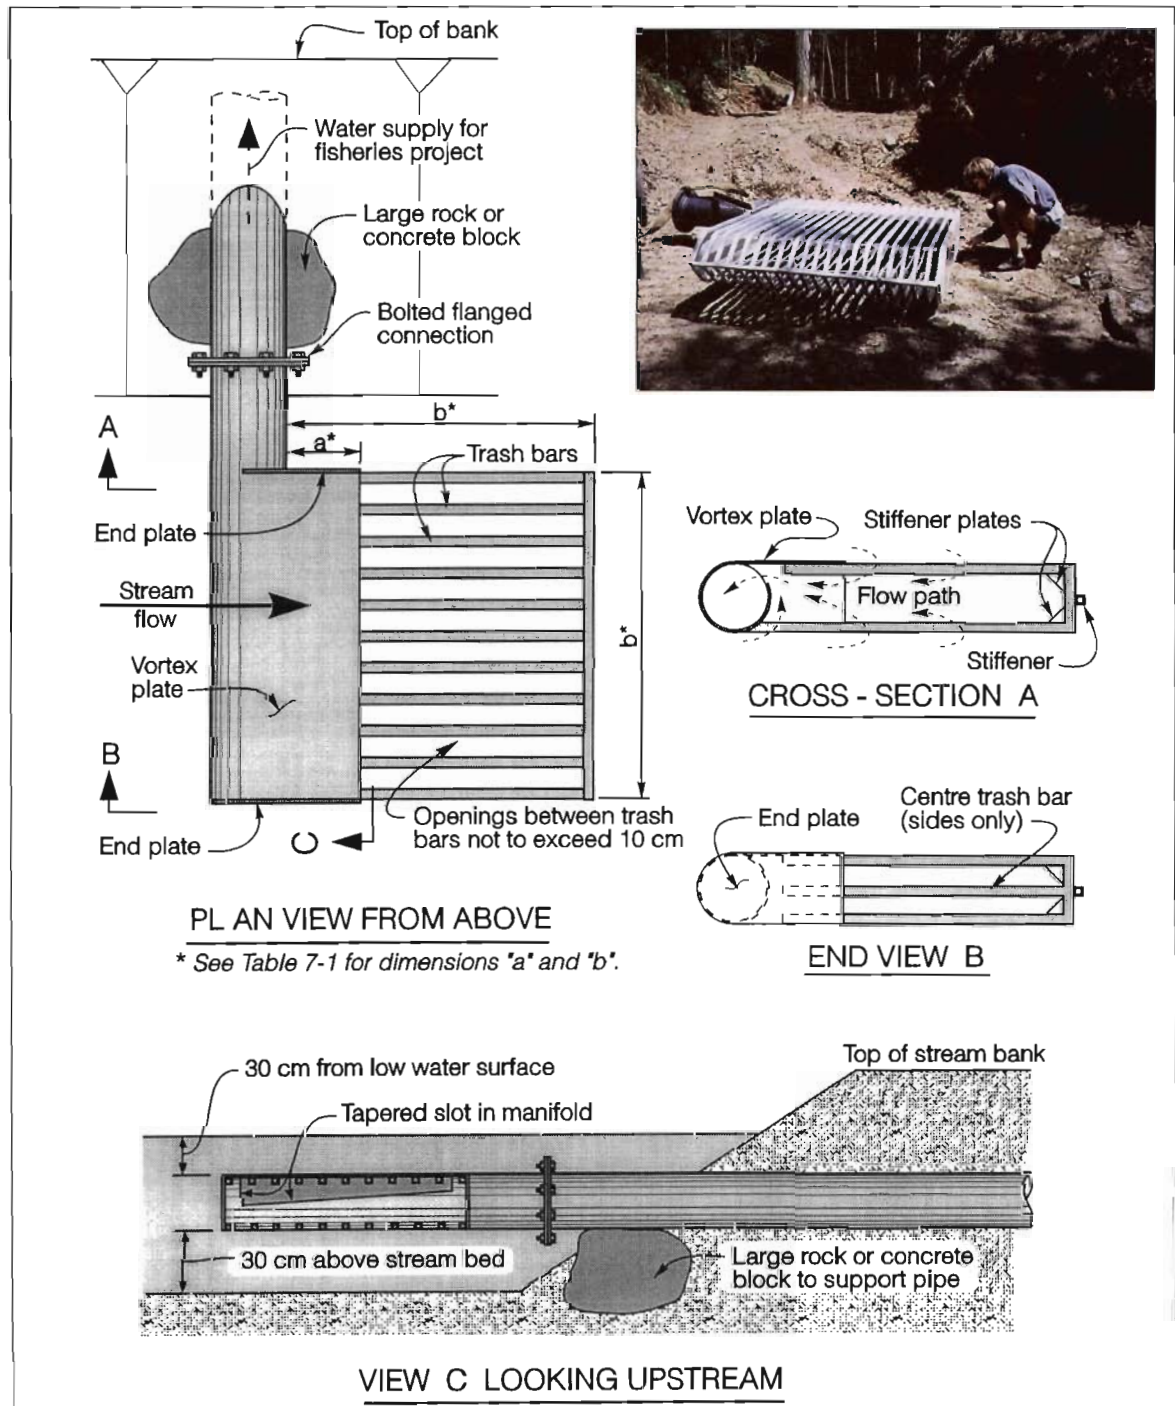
Concept of a manifold-type intake, bolted to steel pipe buried in stream bank.
